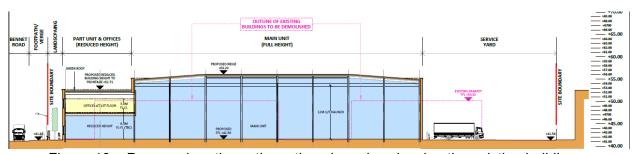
Proposed north-south section plan, also showing the existing buildings
